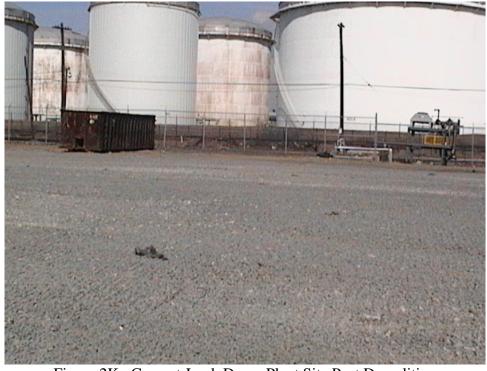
K. Cement-Lock Demo Plant Site Post Demolition and Site Restoration (Looking north northwest)
